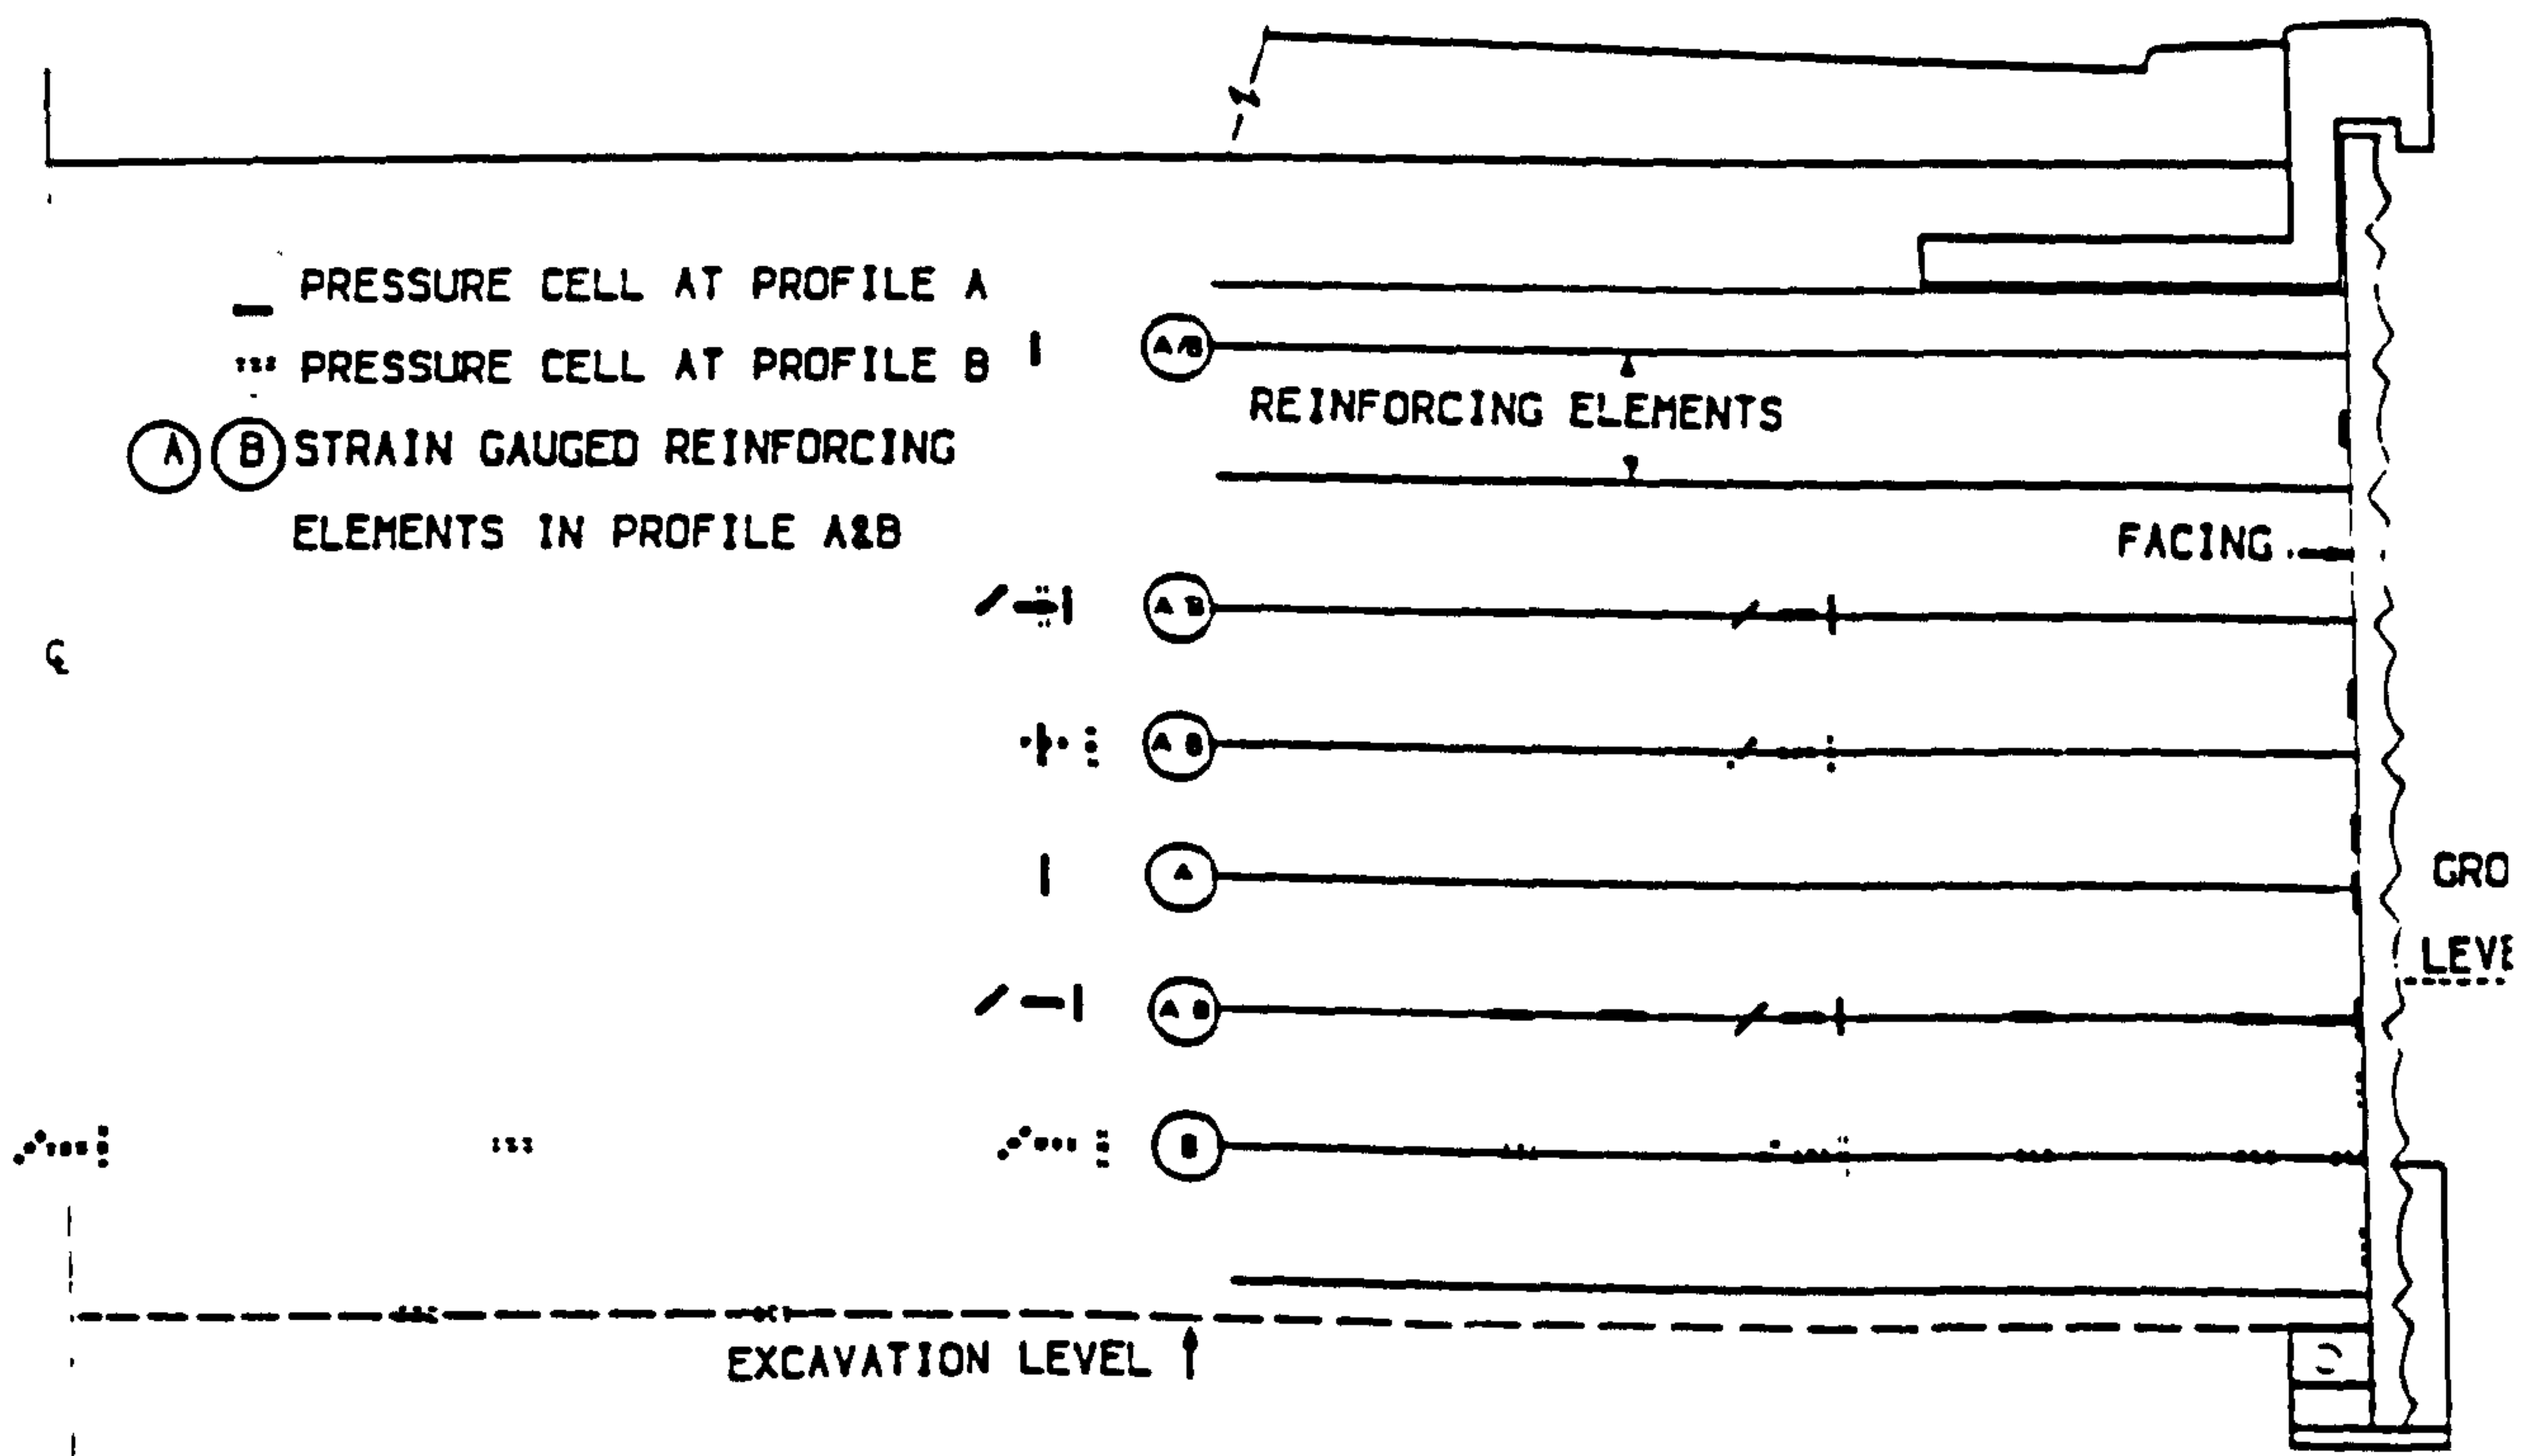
32. B) INSTRUMENTATION OF GUILDFORD BYPASS WALL (AFTER MURRAY AND HOLLINGHURST, 1988).
